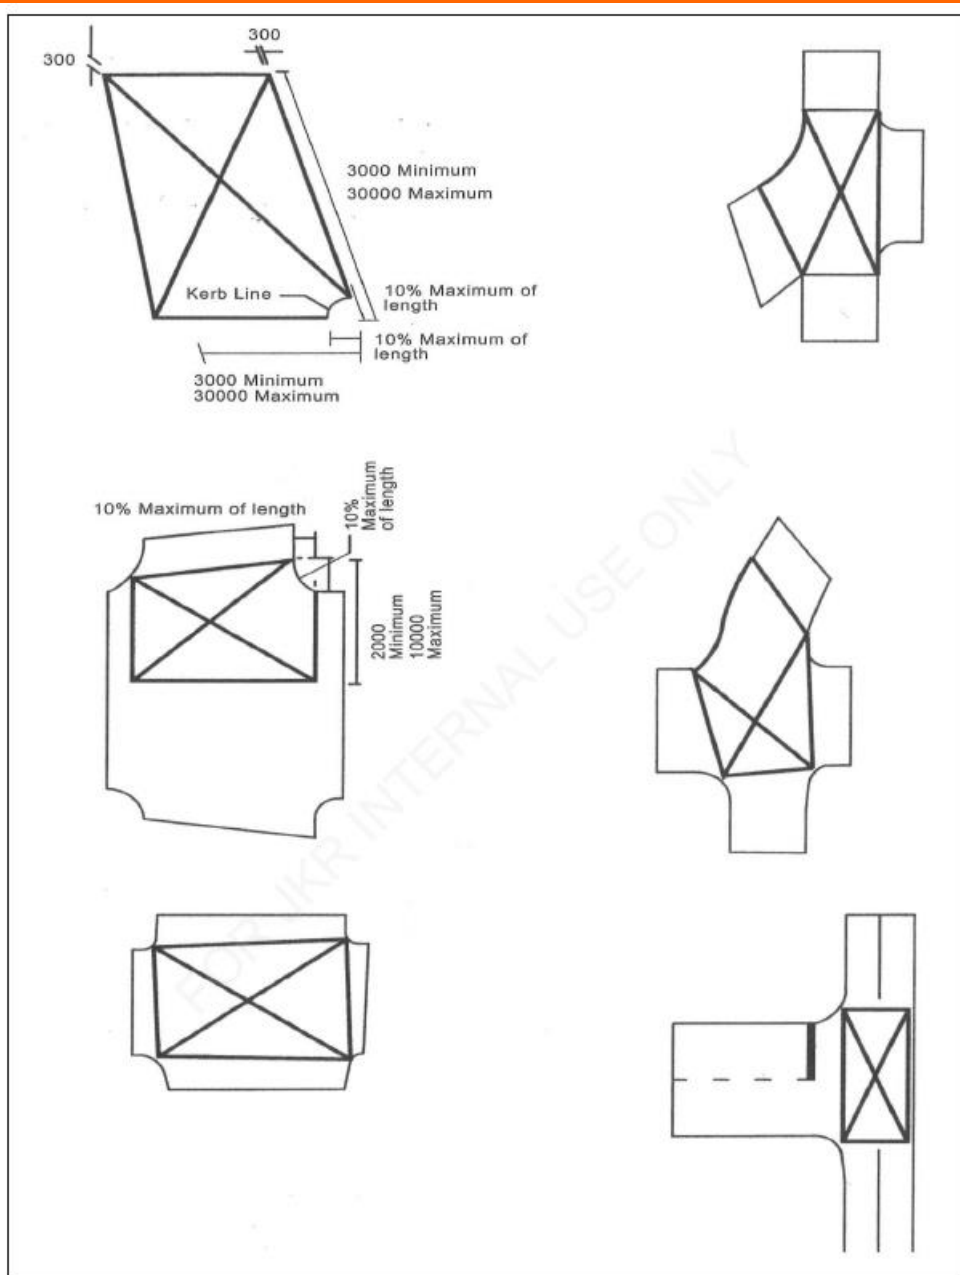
A : TYPICAL BOX JUNCTION WITH CRISS-CROSS YELLOW LINES PAINTED ON PAVEMENT
